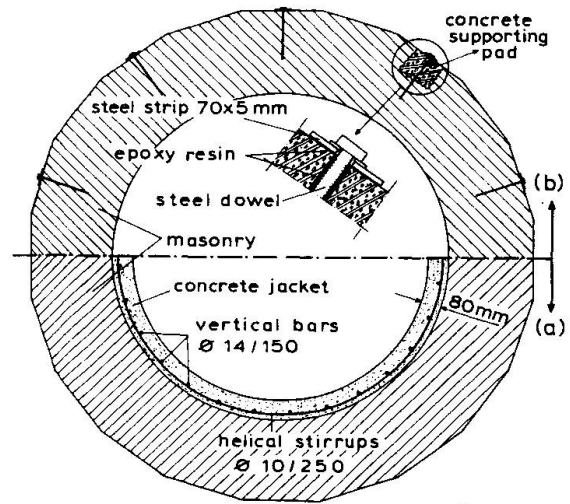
Semisections of Minaret trunk: (a) Internal concrete jacket, (b) External steel strips
